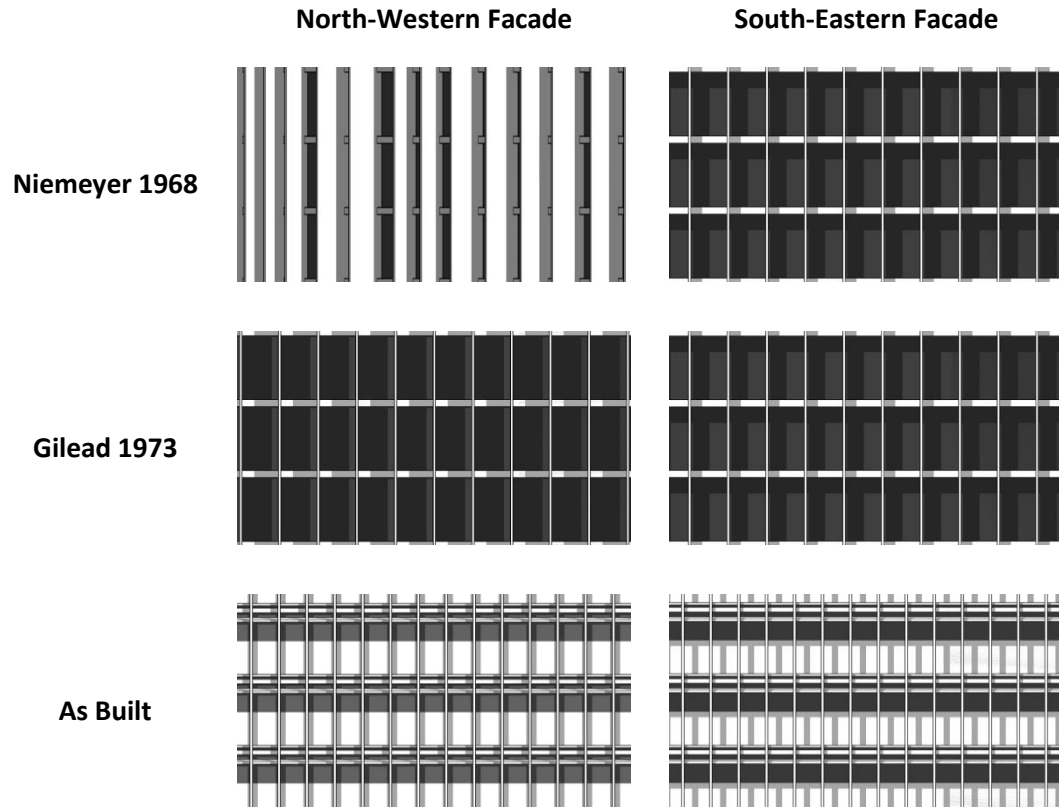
Eshkol Tower, shaded elevations of the main facades with the three sun breakers designs. Shading reflects daylight conditions for 21 September at 17:30 (north-western facade) and 11:30 (south-eastern facade)
